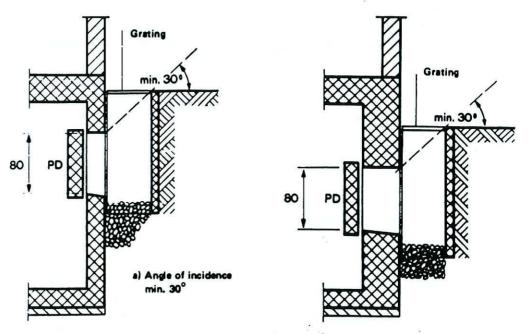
Arrangement of emergency escape-shaft with light opening.
